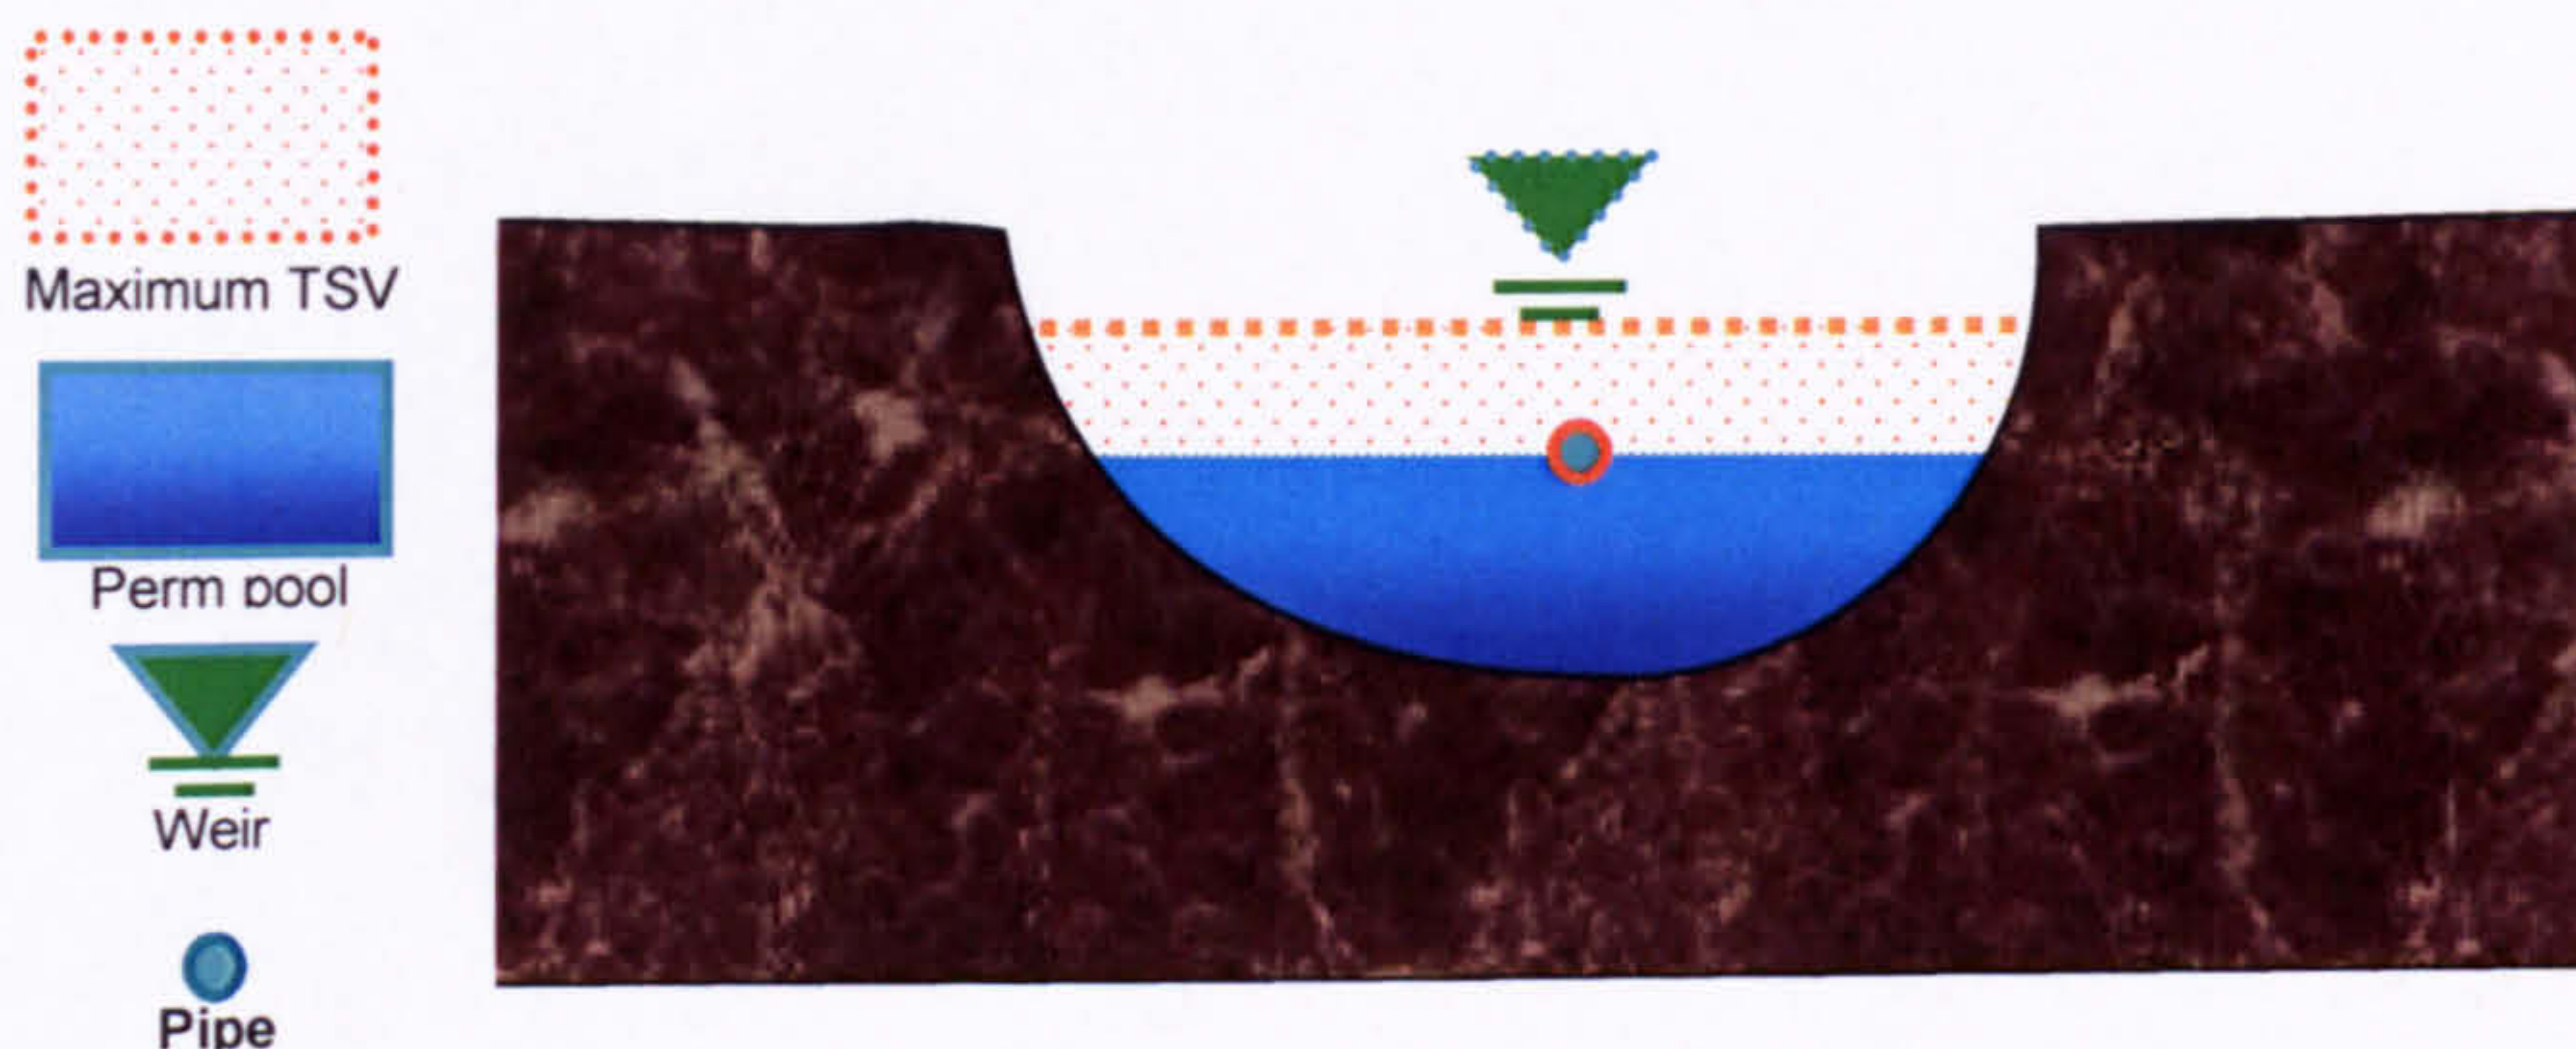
Configuration 3, a dual-level outlet retention pond (Schematic diagram not to scale). Note the presence of the secondary outlet at an elevation of 1.5m in the pond enables the presence of a permanent pool, whilst also enabling the provision of TSV (as indicated by the dotted area).
